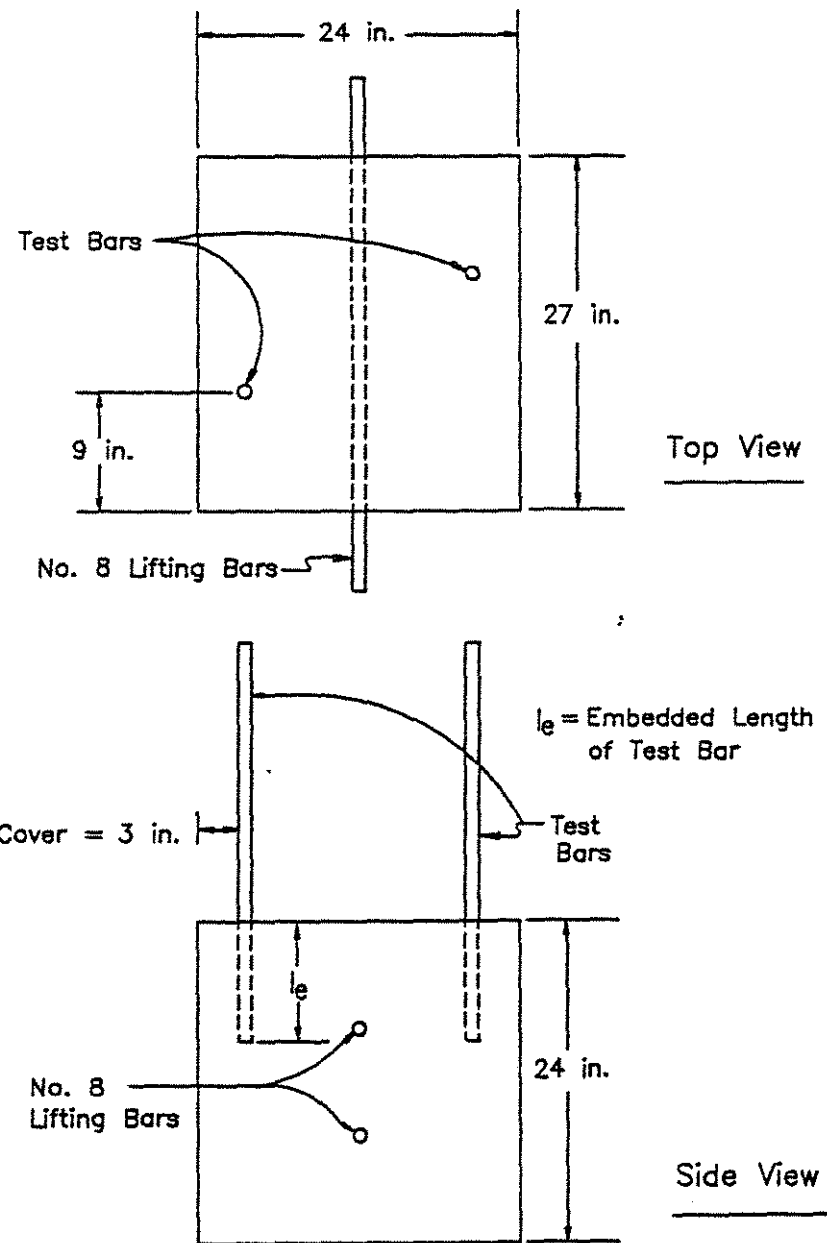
Typical Test Specimen with Vertical Bar Installation
